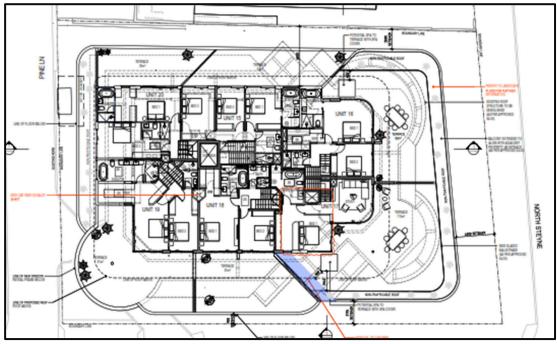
Level 4 Floor Plan; (amendment in orange clouds + text); Squillace, September 2022
